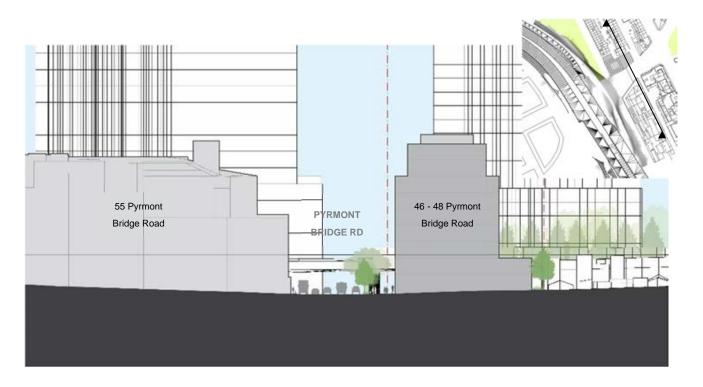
section of 46-48 Pyrmont Bridge Road, looking west
